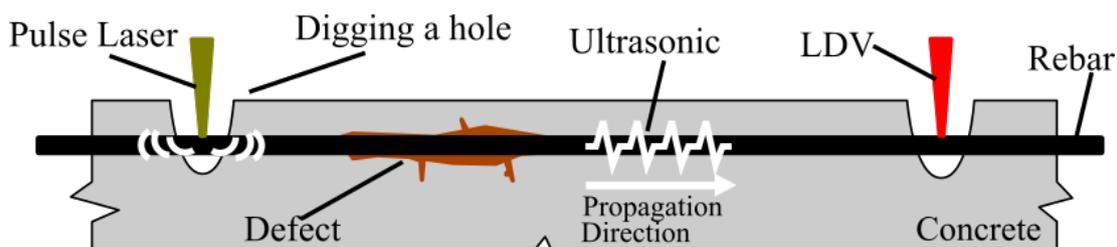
Concept of the remote nondestructive testing method for reinforced concrete structure
